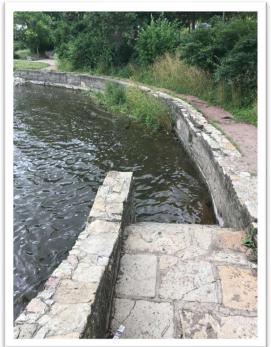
North Aurora Dam View from East Abutment Looking West (IDNR)
